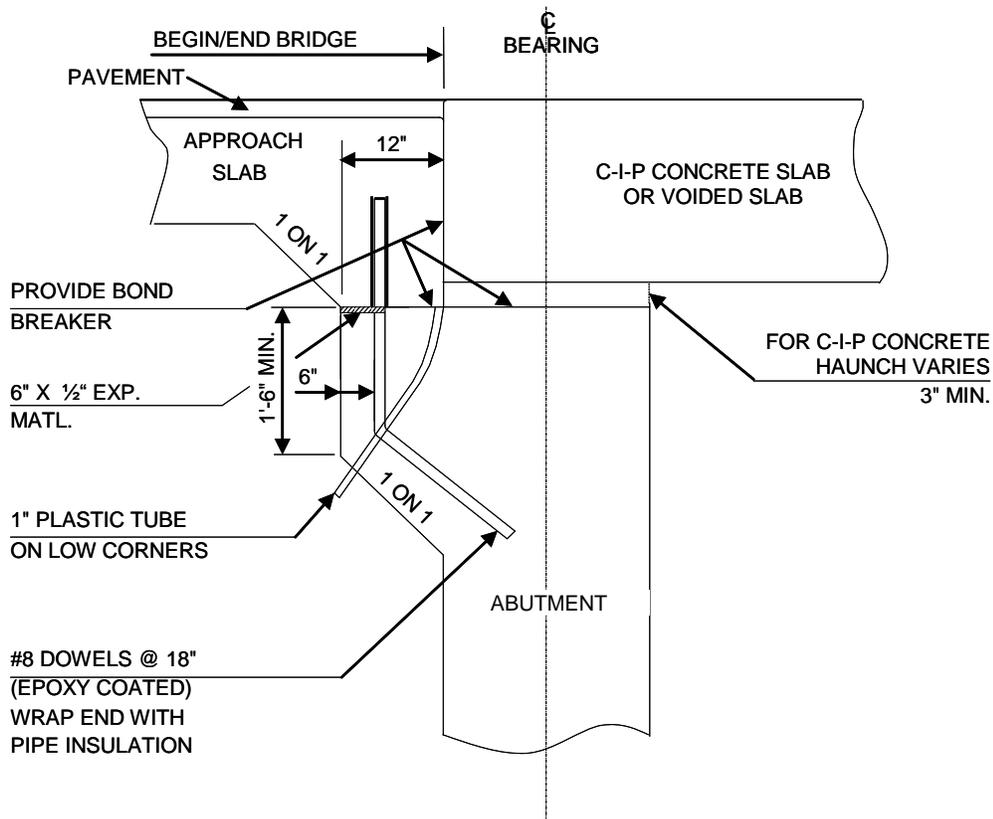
1 Type C – Bridge Ends (both abutments) for short spans with Approach Slabs.
